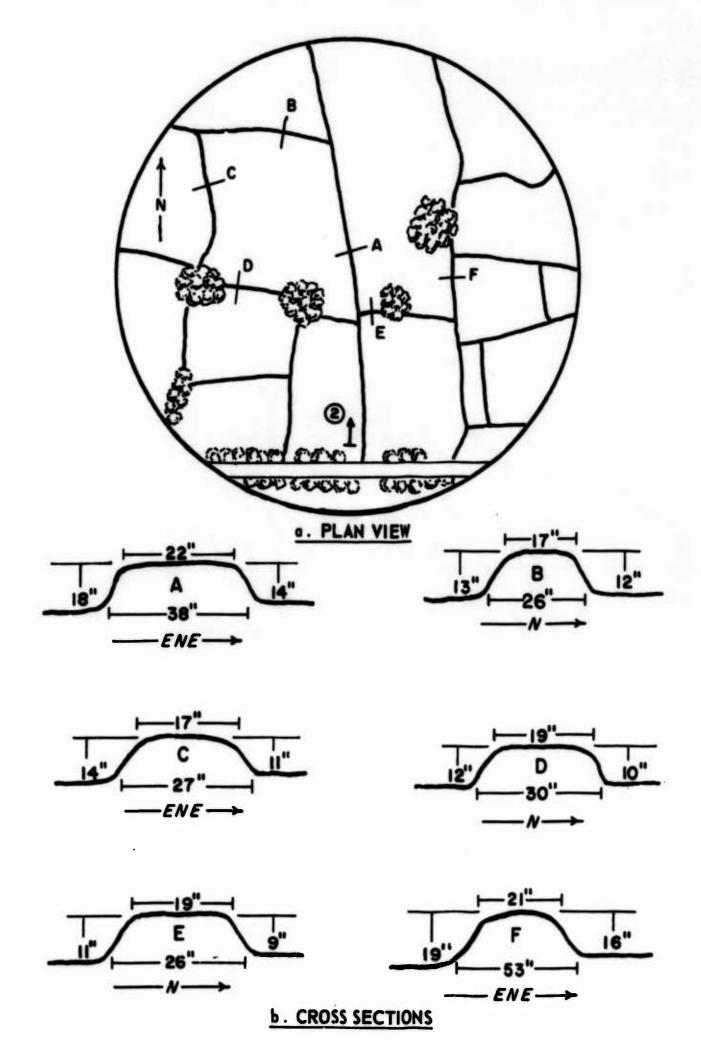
Terraced paddies--dike plan view and cross sections at site SG-116 (September 1964)
